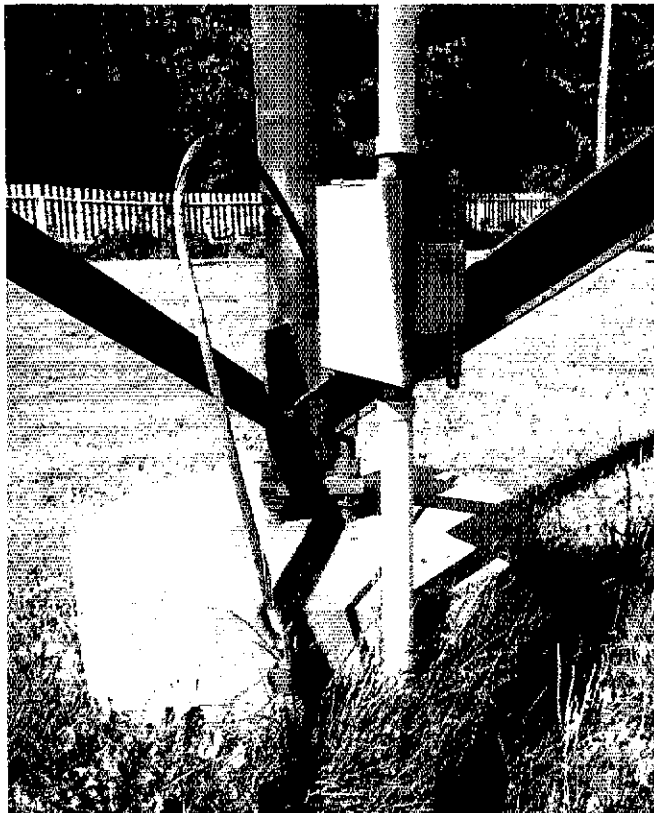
PVC-pipe conduit carries power and control wiring to the rotator platform. Each tower leg is grounded by means of a 10-foot ground rod and no. 00 wire.
